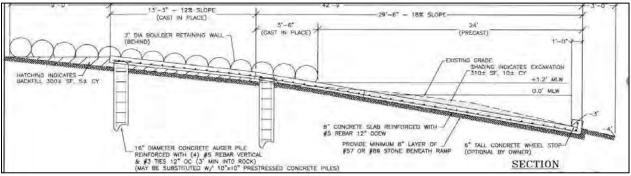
Example drawing of a boat ramp installed by placing prefabricated concrete slabs. Note that excavation was minimal (removed approximately 10 yd³ in this instance) and limited to shaping the slope of the boat ramp. This ramp extends to -3 ft mean low water (MLW). Drawings prepared by Glen Boe and Associates submitted to NMFS as part of a consultation request.
